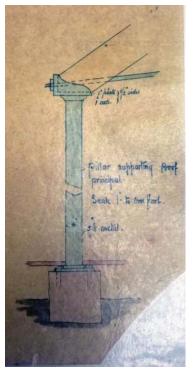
Detail of pillar supporting roof of the proposed showroom, dated 1873
